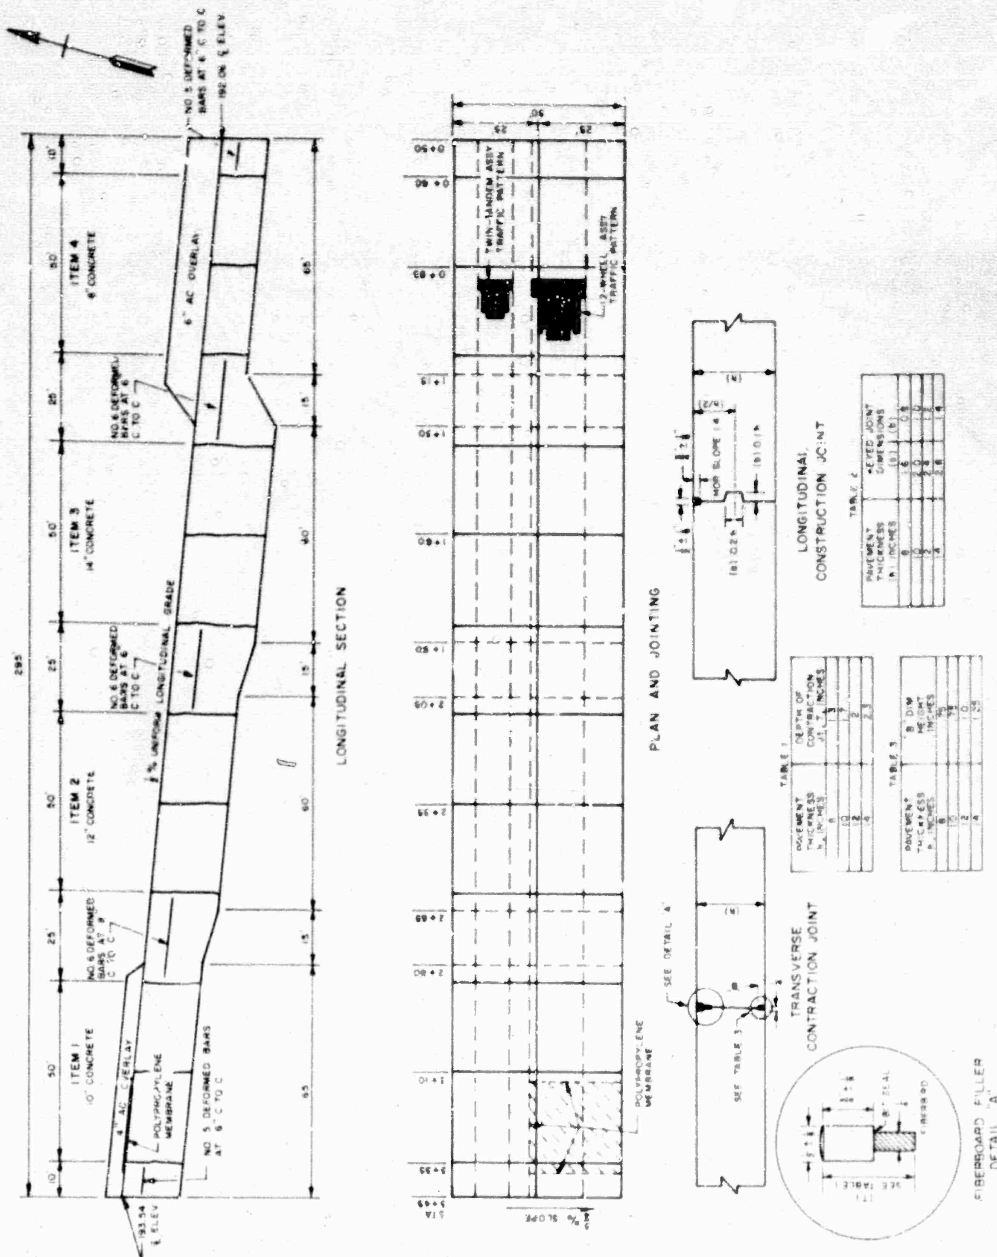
Plan, Profile, and Joint Details of the Rigid Pavement Test Section
